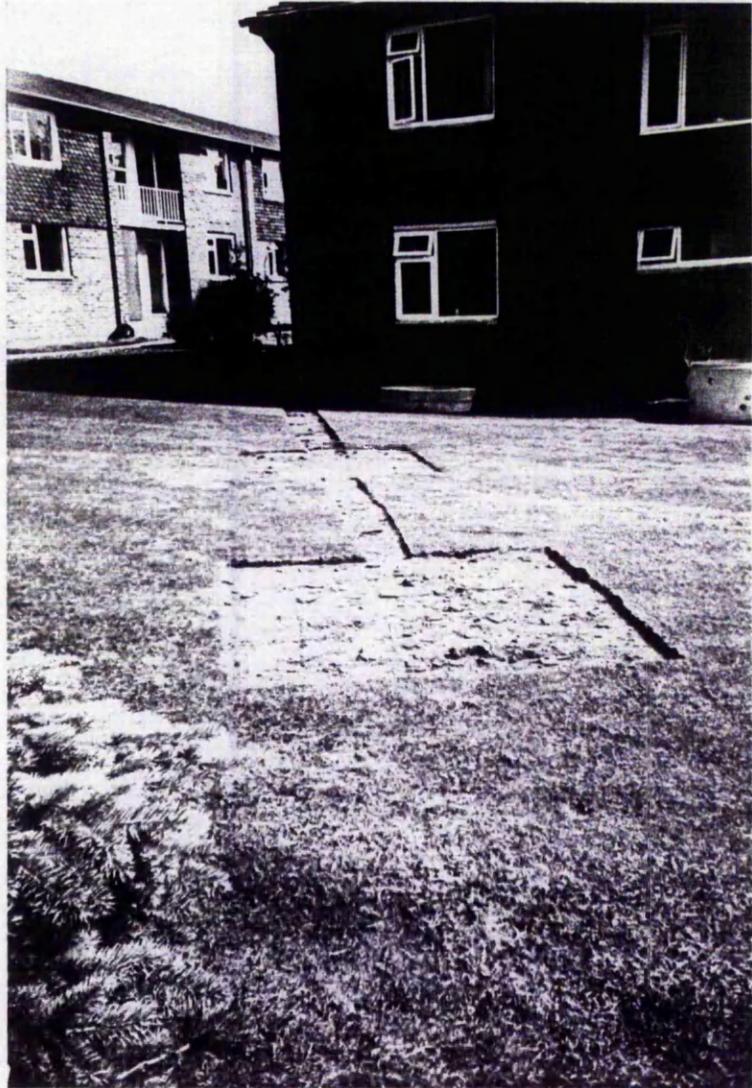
De-turfing prior to construction of the dual-chambered soakaway.
